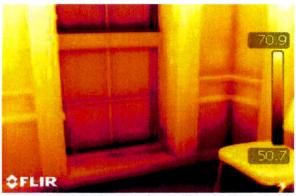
Thermographic image from inside Room 202 shows cold air infiltration in the wall at an outside corner and at the floor.
